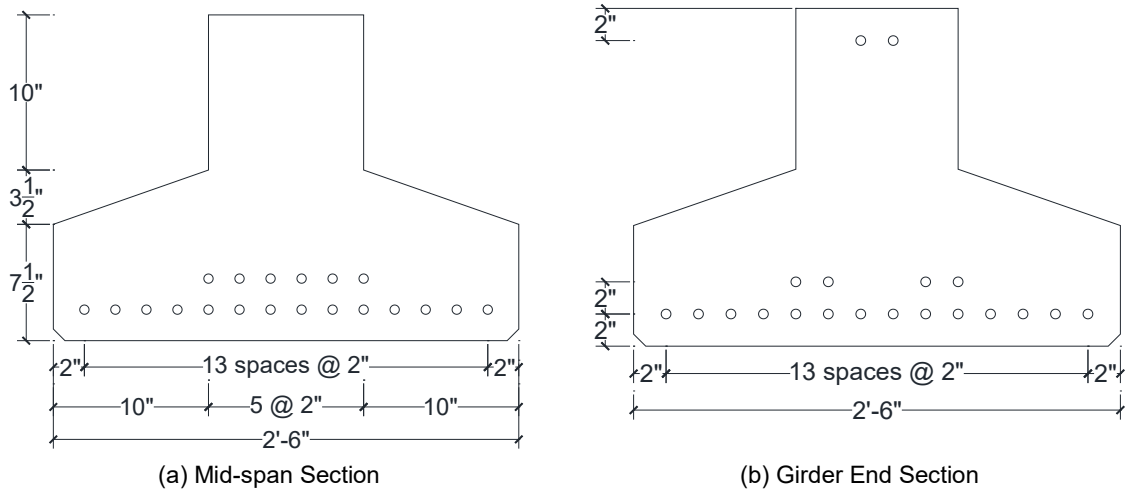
Inverted Tee Girder Cross Section with Two Harped Strands
